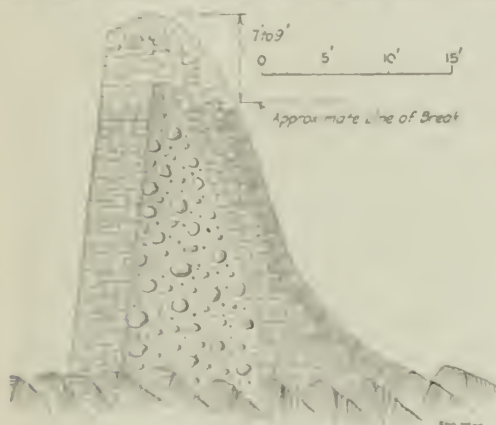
CROSS SECTION THROUGH HANNAWA FALLS DAM, SHOWING BREAK IN ASHLAR FACING
